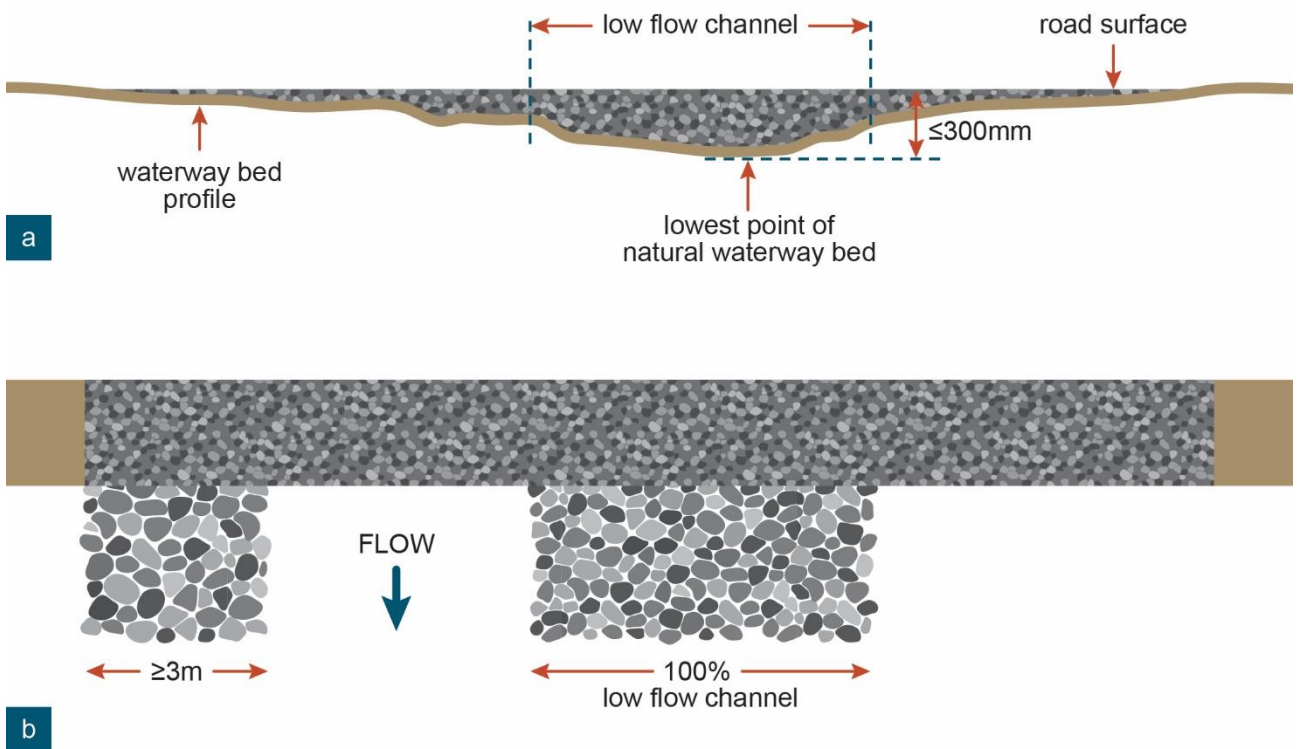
Low level crossing option 2 – amber waterway (a) cross-section of waterway (b) plan view
